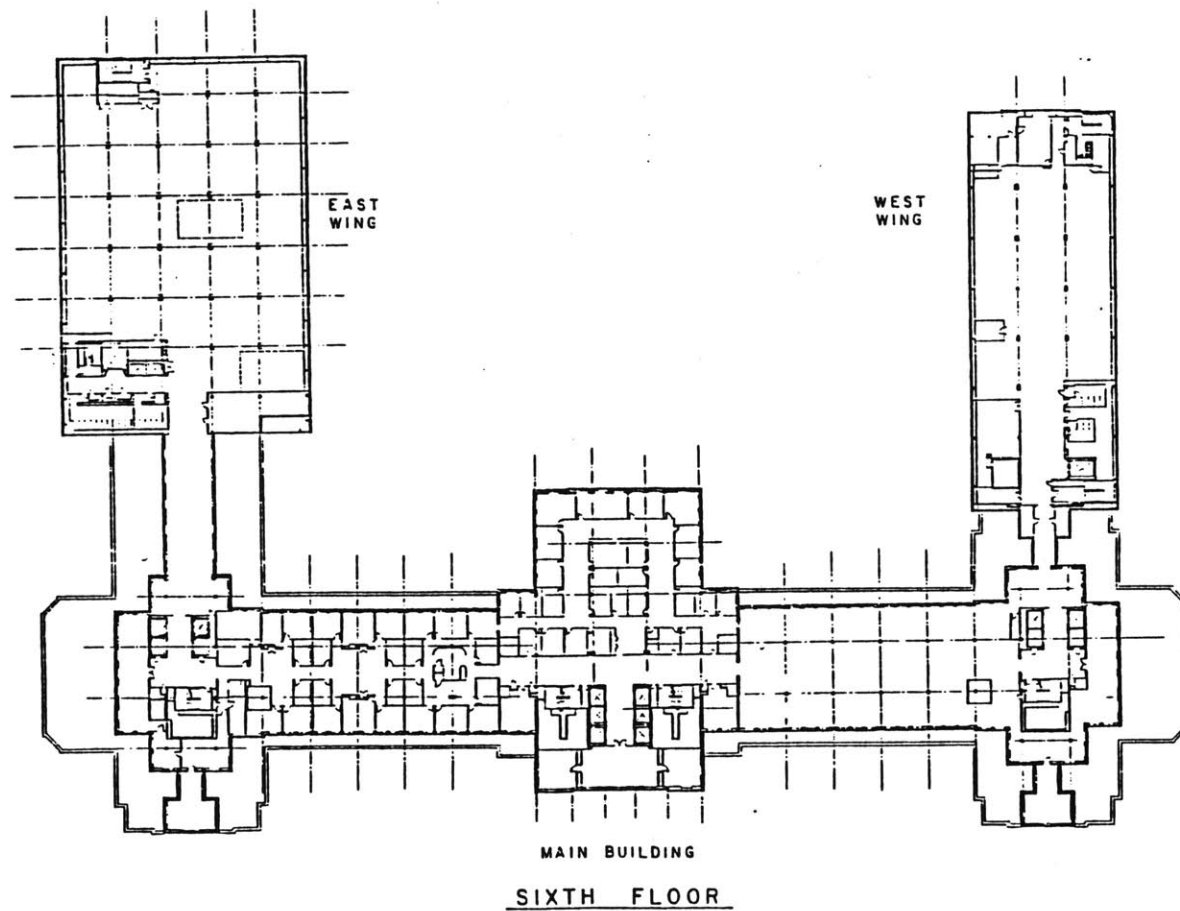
PLAN SIXTH FLOOR OF MAIN BUILDING
